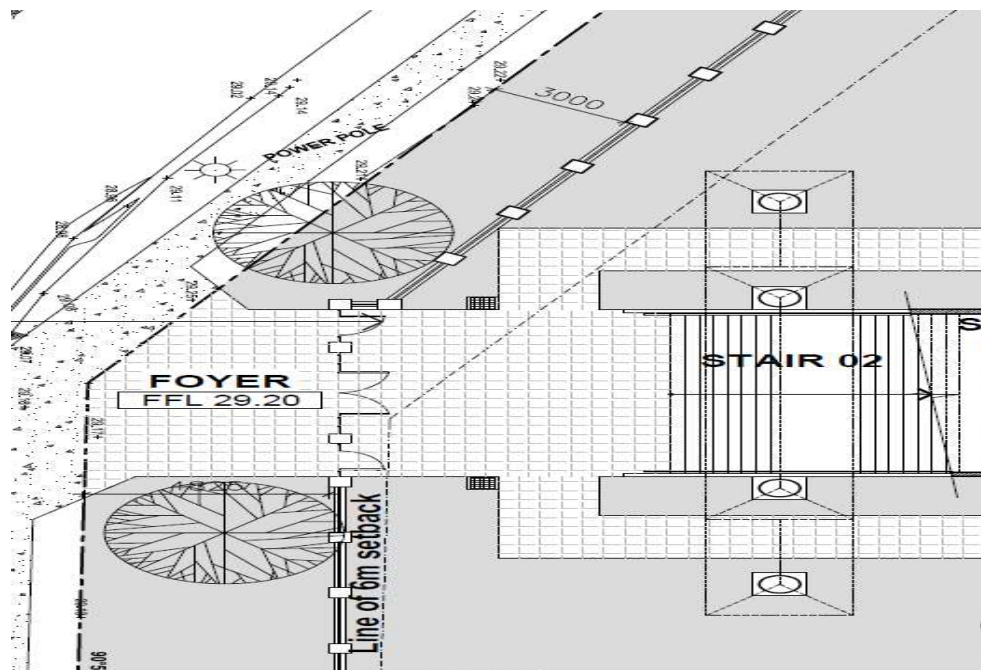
below is an extract from the ground floor plan which shows setbacks applicable to the front fence (3 metres minimum) and the 6 metre building line, the entry stairs and the location of the entry archway.
